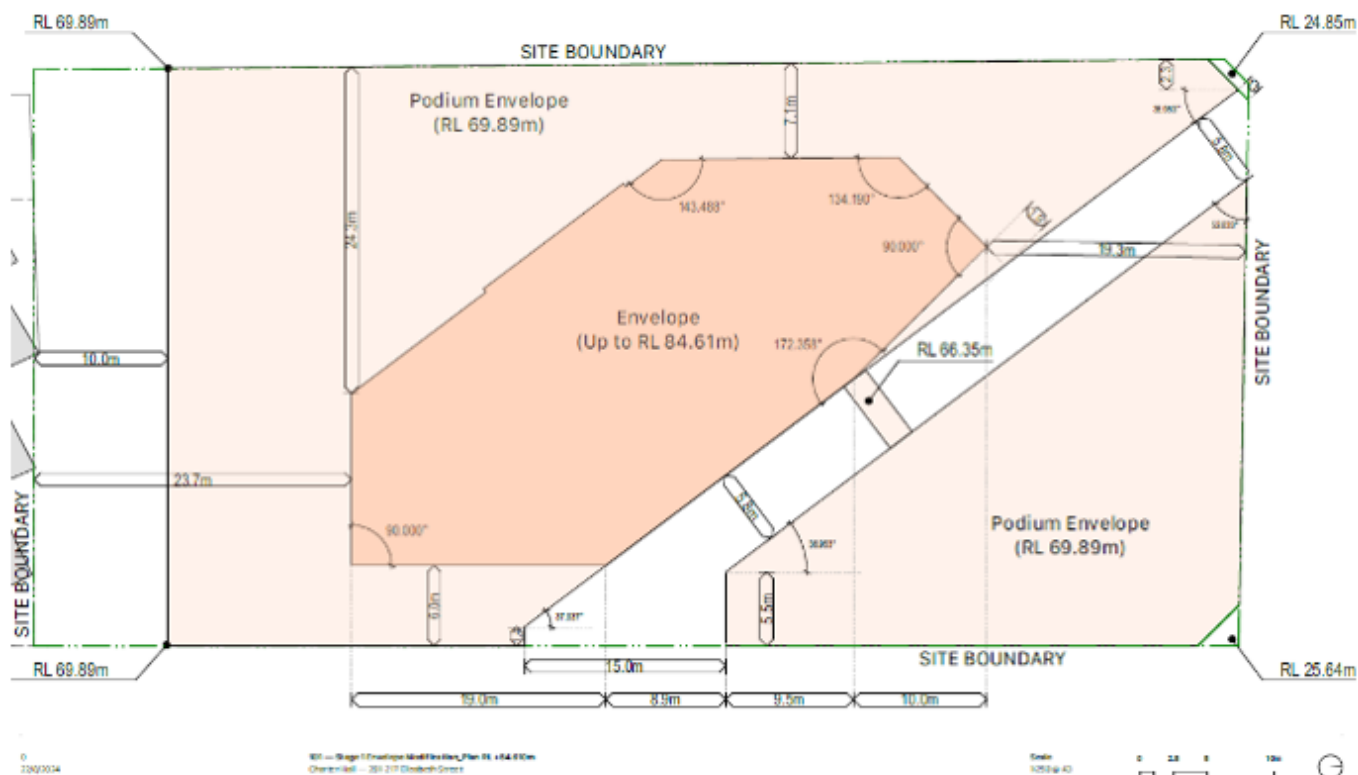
| Proposed podium envelope (up to RL 69.890) and low-rise tower (up to RL 84.610) (Source: Ethos Urban modification plans)
